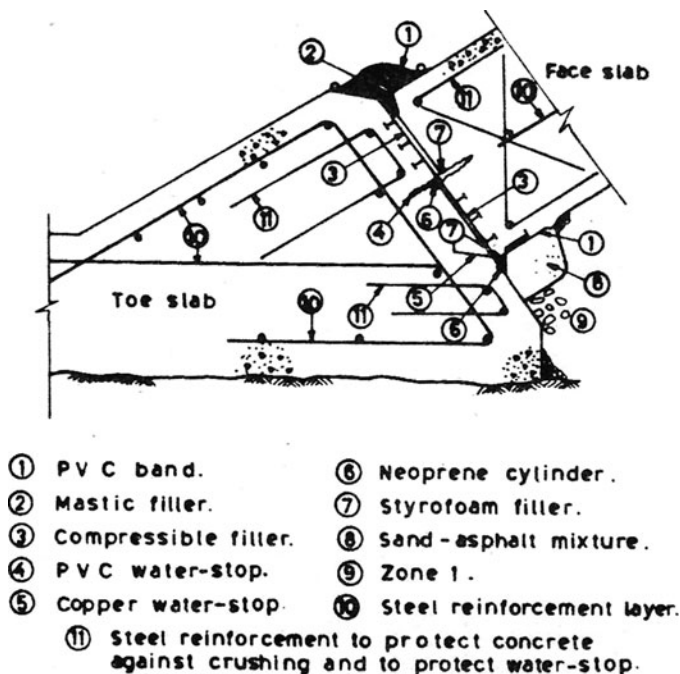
Details of the perimetral joint at bottom of canyon.
